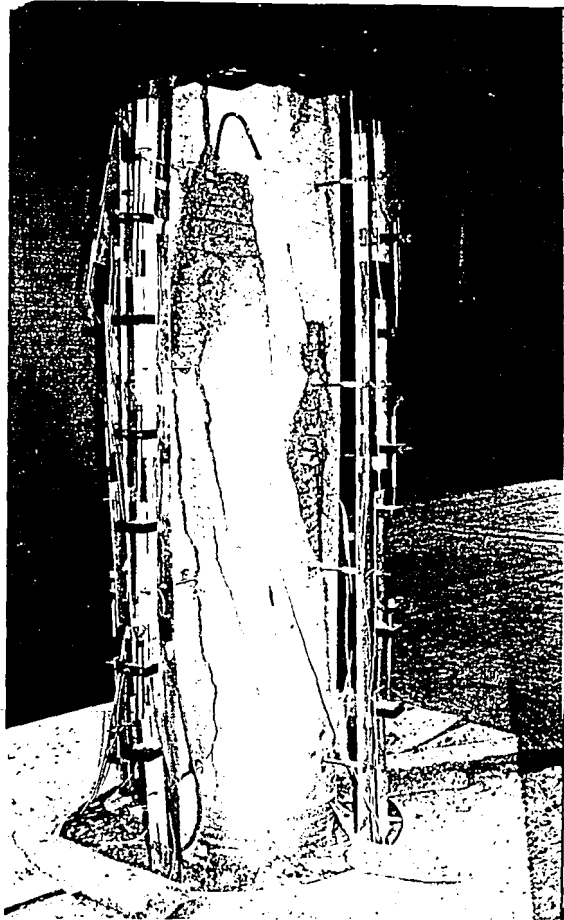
(c) Specimen M3-series of key photographs; (c) separation of cover concrete in long sheets.
